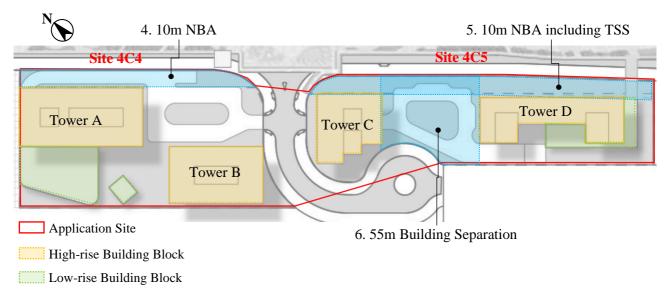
Layout plan of Site 4C4, 4C5 and area shown as 'road' of Baseline Scheme
